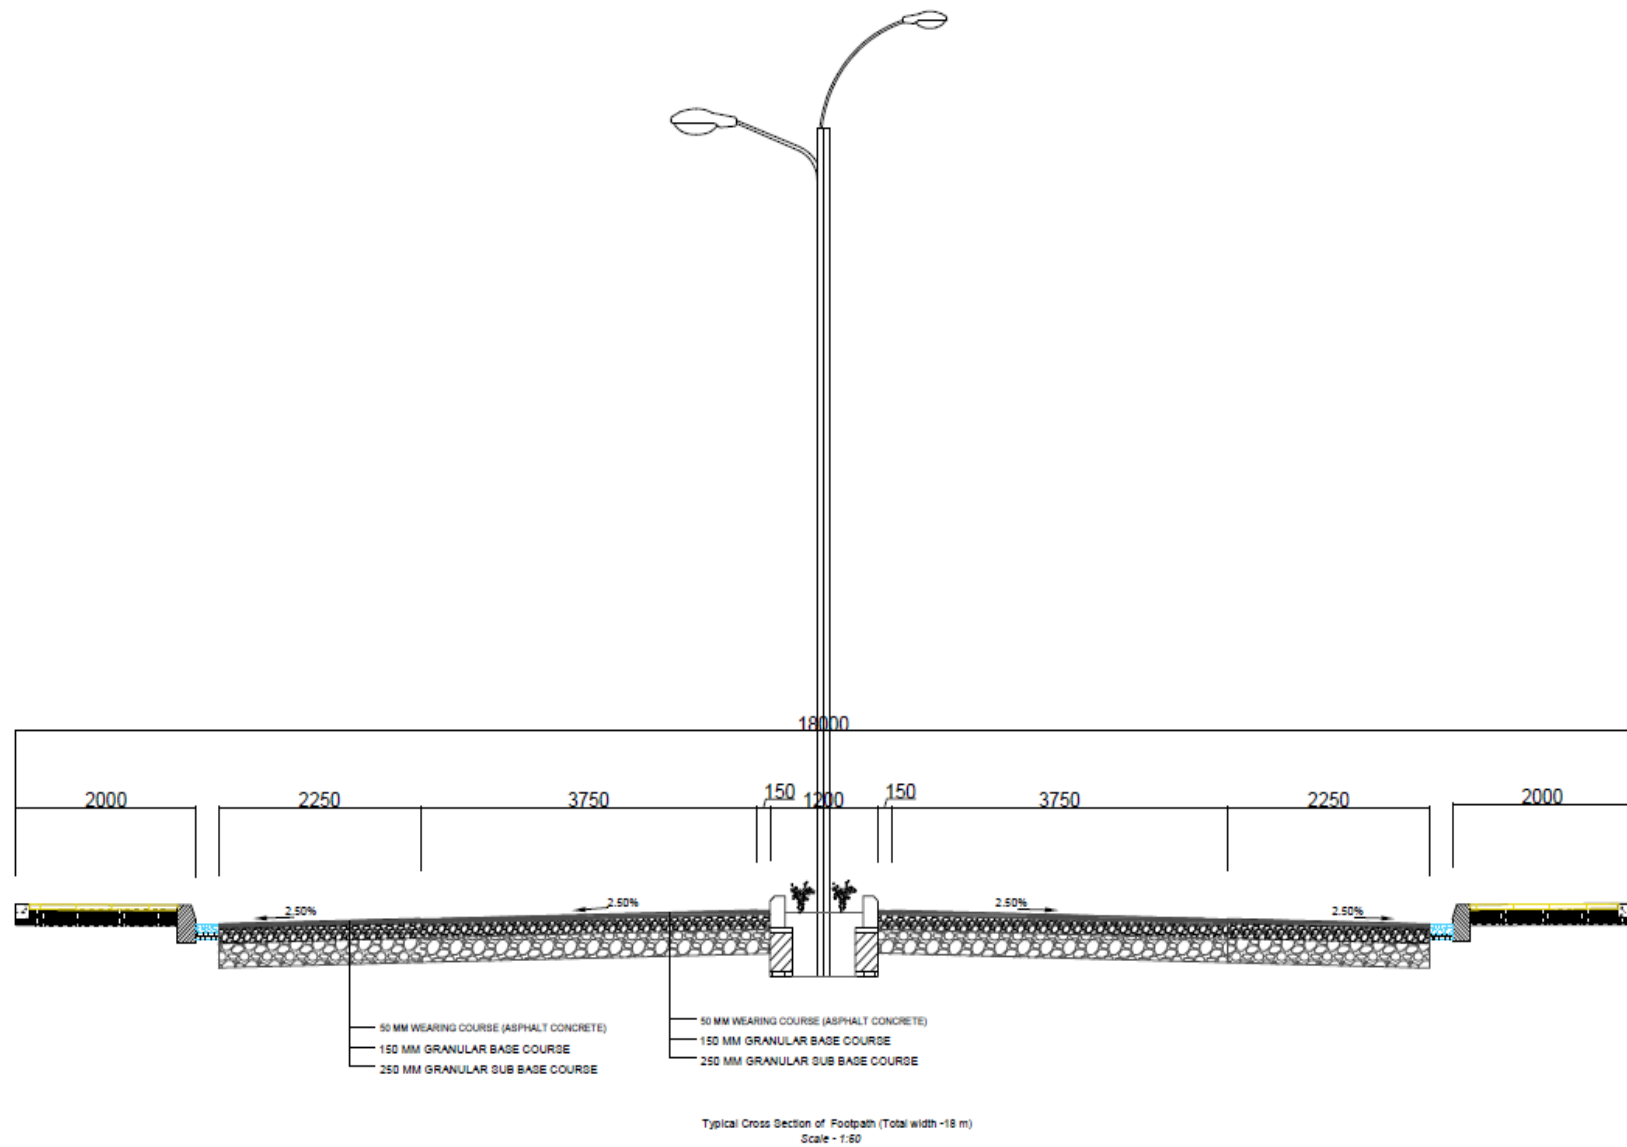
Typical Road Sections with Footpath, Drain and Retaining walls (18.0 m)
